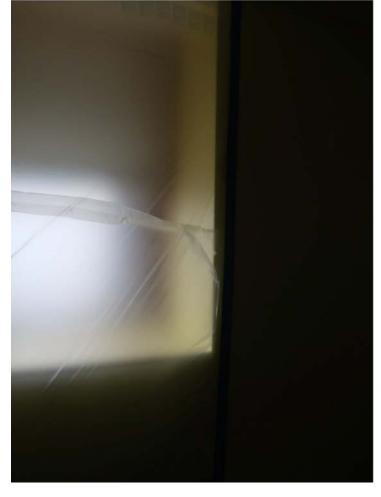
Unit 5 Exterior Wall Where Window Work Will Be Done
